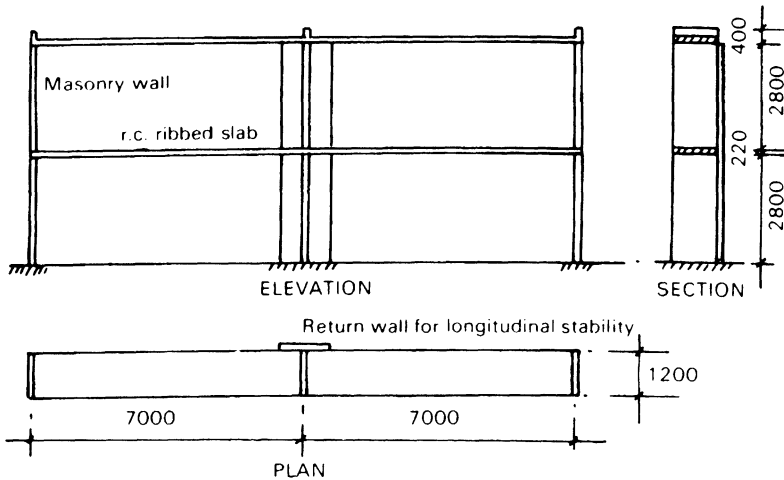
Outline of test structure for wall–floor slab interaction (Germanino and Macchi)
